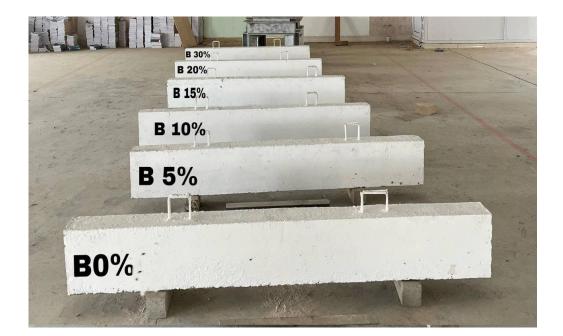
Reinforced Concrete Beams Used for All PVC/SAND
